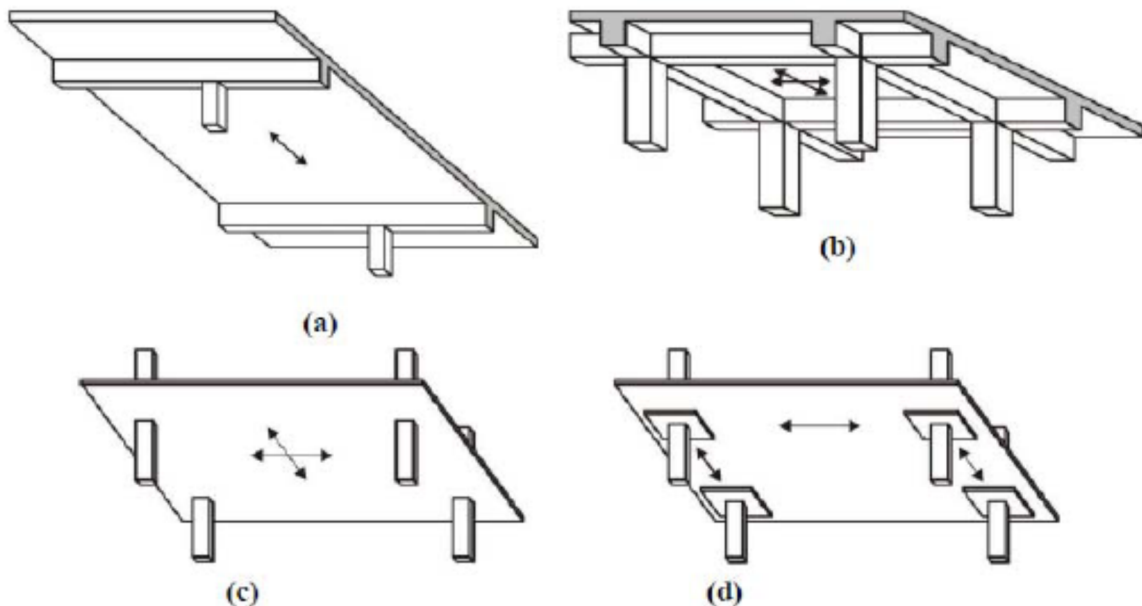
Connections between floor slab and column. A) Slab with supporting beams transferring load in one principal direction B) Slab with supporting beams transferring load in two principal directions C) Flat slab D) Drop Panel Flat Slab [CT3150, Concrete Structures 2]
